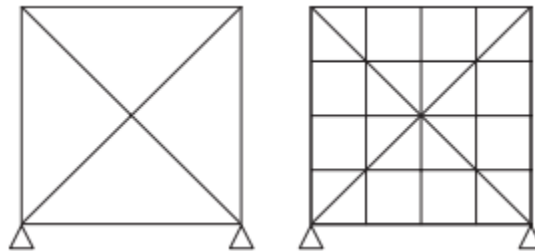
numerical models elements for timber frames (left) and masonry walls (right) [18]
